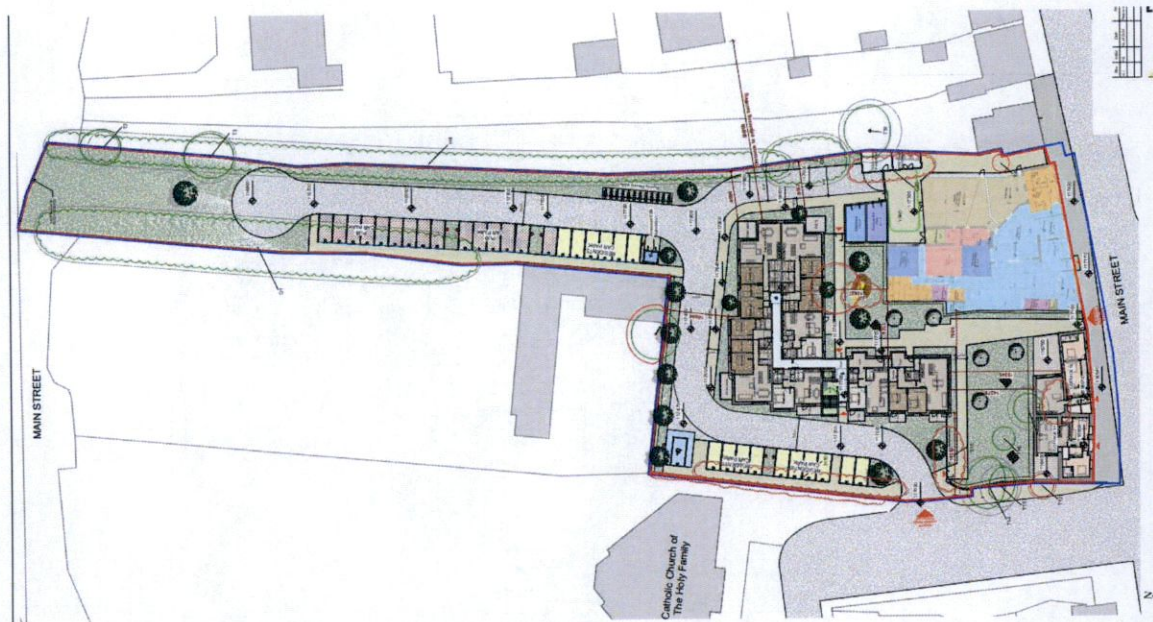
Extract of Ground Site Layout proposed for the AI stage.
